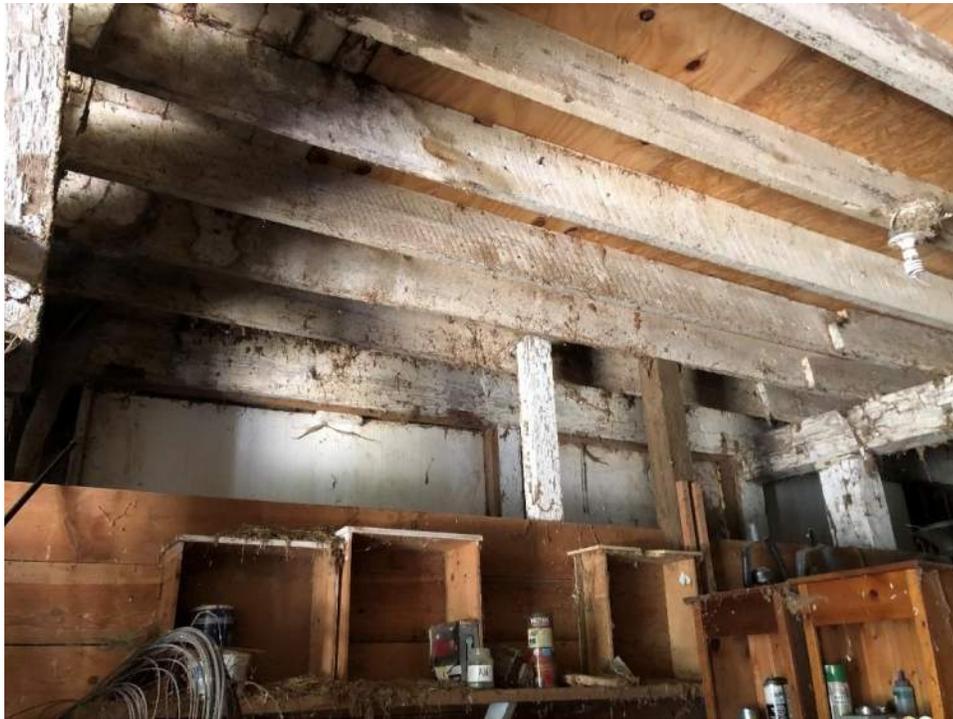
View of the floor beams supporting the threshing floor on the north side, looking from the lower level.
